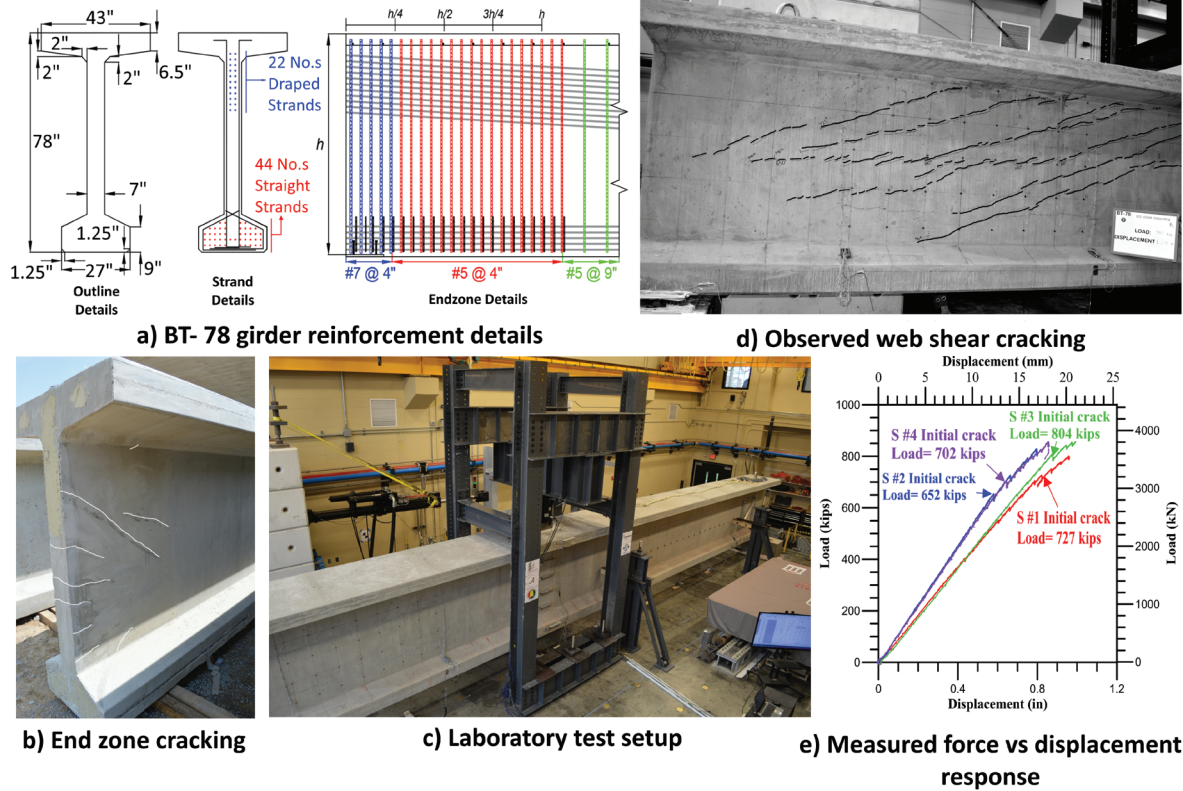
Details of BT-78 girder field end zone monitoring and laboratory shear testing. Note: BT-78 = 78 in. deep bulb-tee girder; h = girder height. #5 = no. 5 = 16M; #7 = no. 7 = 22M; 1" = 1 in. = 25.4 mm.
